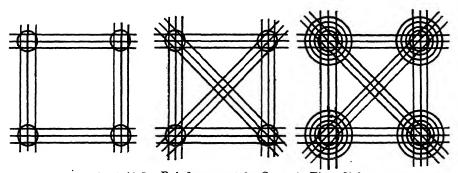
J Reinforcement for Concrete Floor Slabs
